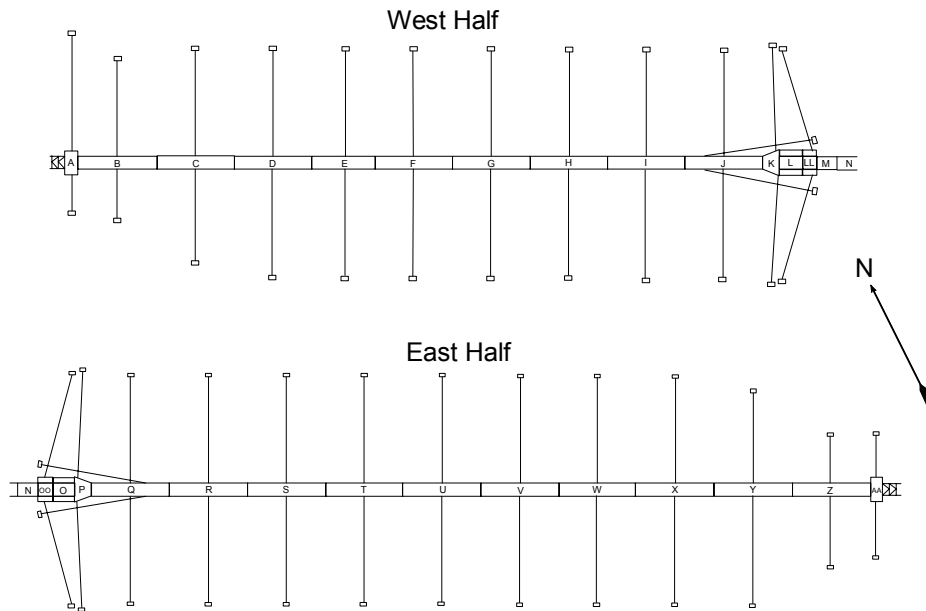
Plan View of the Evergreen Point Floating Bridge
